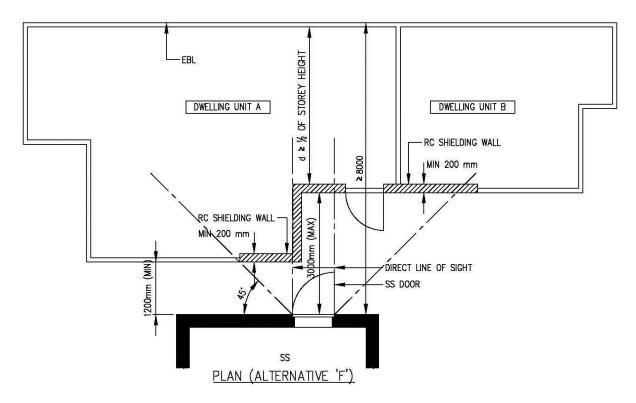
D - Plan - Discontinuous Shielding Wall With Opening Fronting The SS Door
